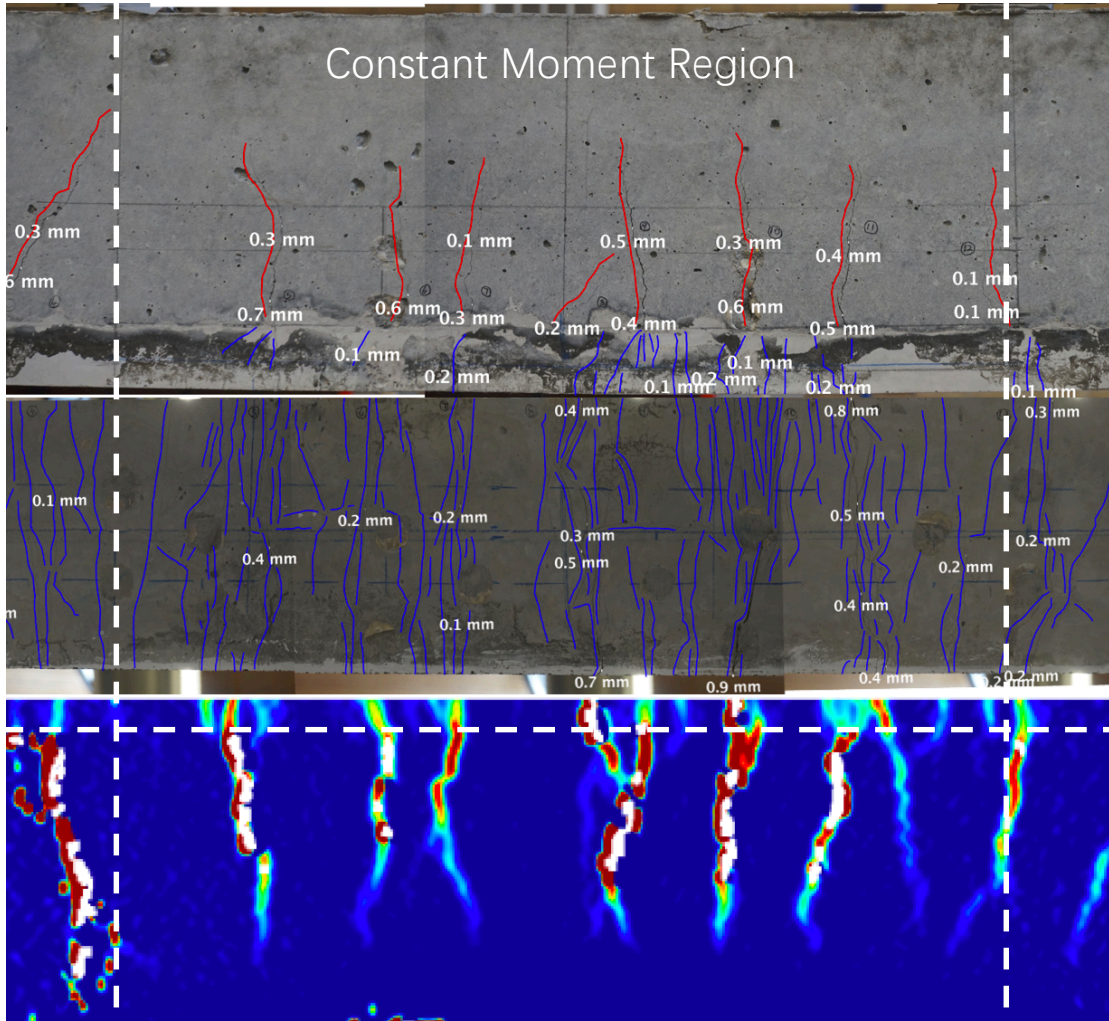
Crack pattern of Test 01 (beam with SHCC+SH layer of 30 mm)
